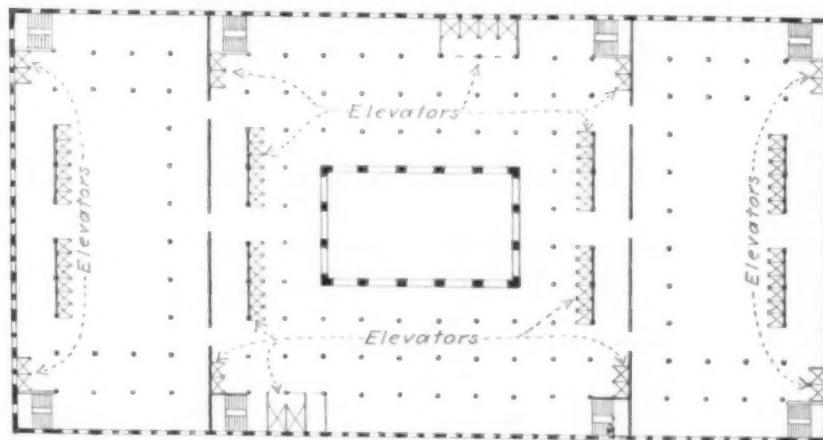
SUGGESTED ARRANGEMENT OF FIRE WALLS, ELEVATORS AND STAIRS FOR DEPARTMENT STORE
